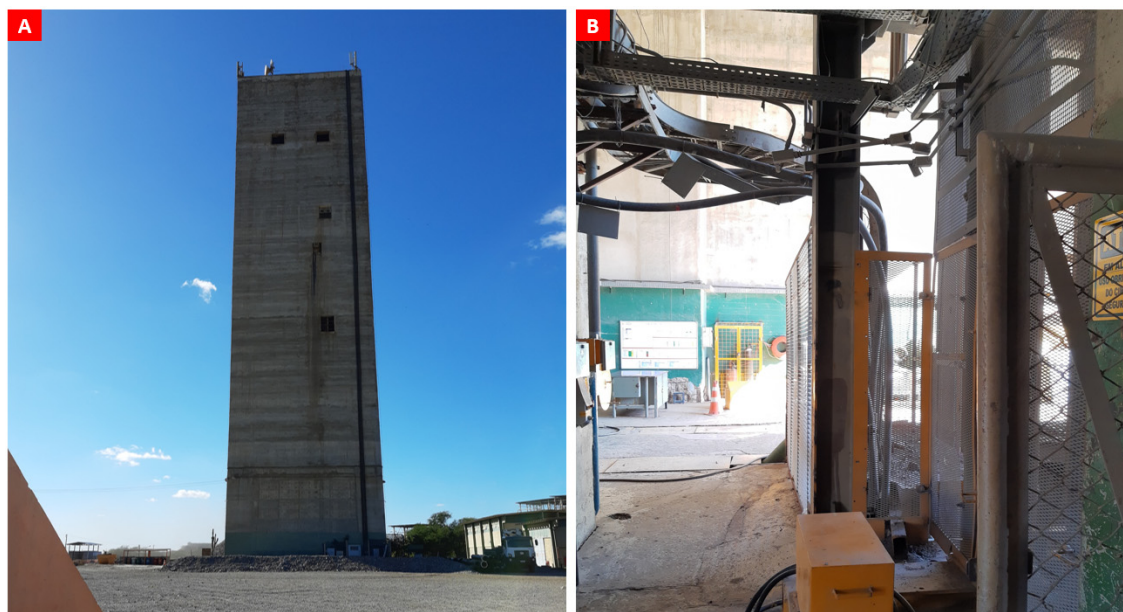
A: Existing Shaft; B: Cables running through Shaft (MCSA, 2019)
